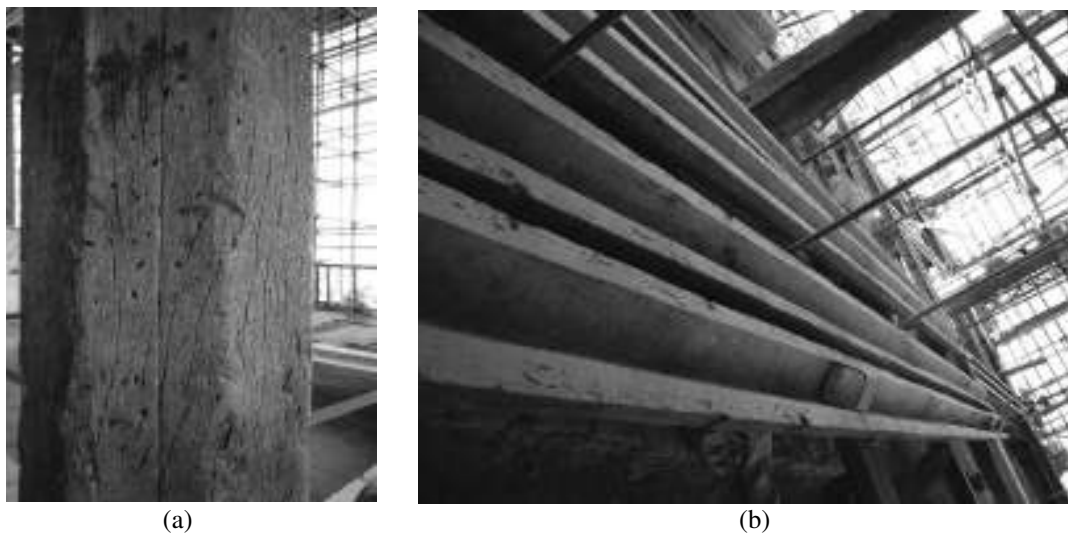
Columns: (a) dry and insect holes, (b) strengthening by cutting and inserting steel profiles (irreversible and excessive intervention)
